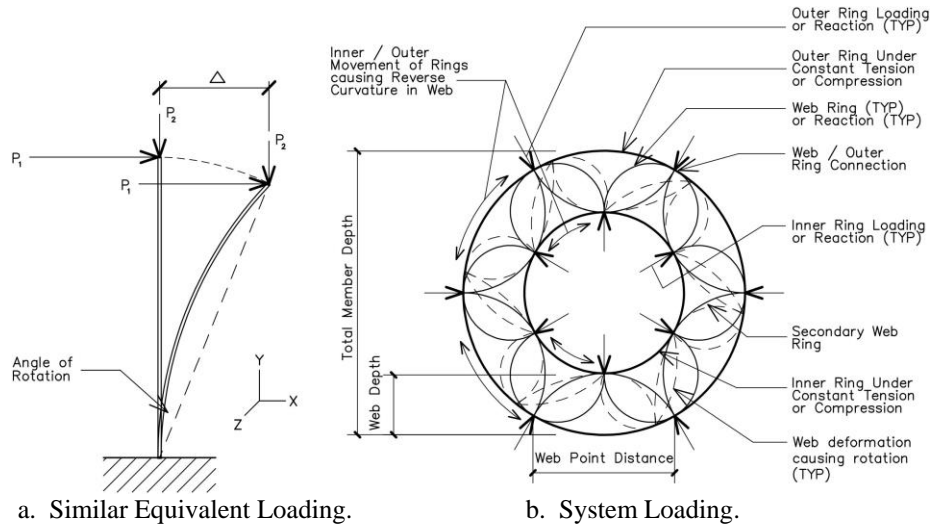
Load bearing structural assembly, i.e., ‘ForceGenie’ component section / elevation schematic.
